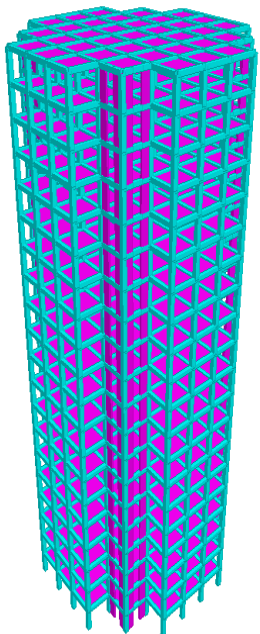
Case WO5: - (Bay size = 5 m x 4 m & shear wall opening area = 1.66 m x 4 m (33.20%))
